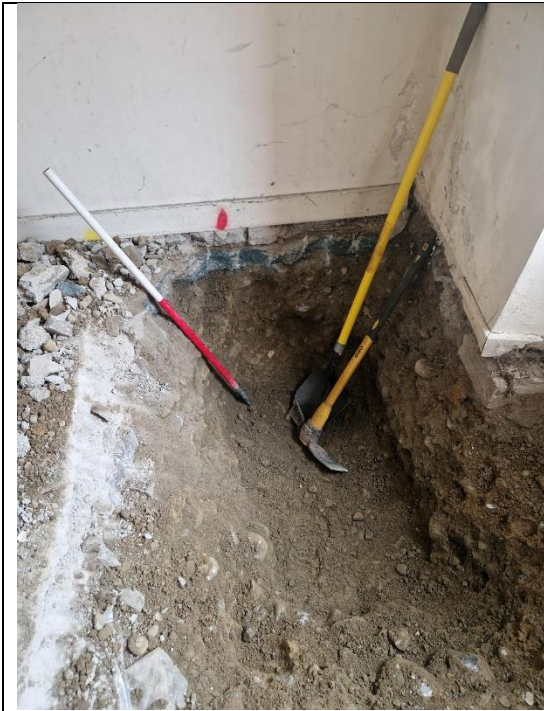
Showing Test Trench 2 in No 7 Patrick Street Upper during removal of C06.
